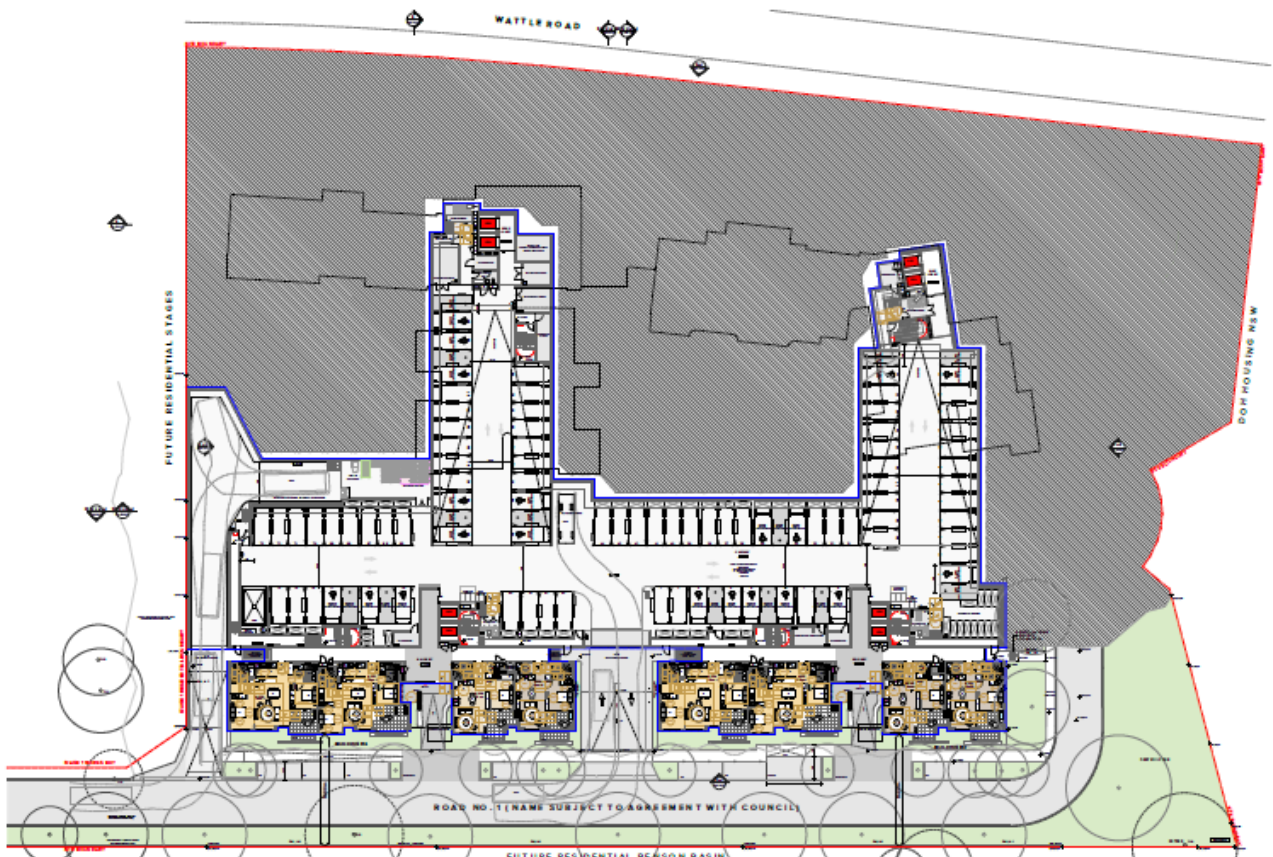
Lower level of basement parking, showing access off western side of proposed new road
